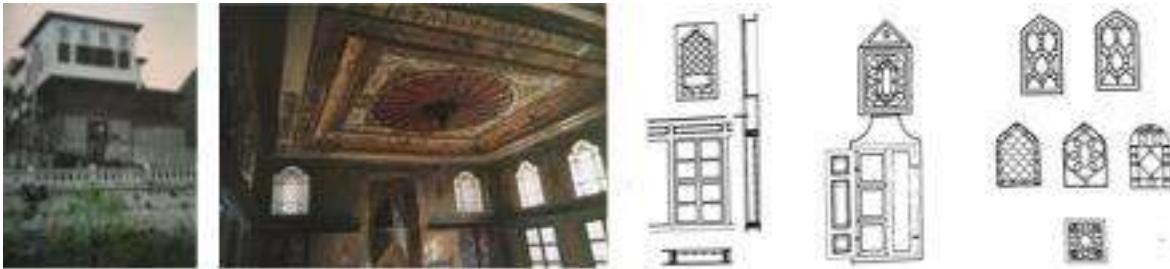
Upper window images and drawings (Kucukerman, 1996)
